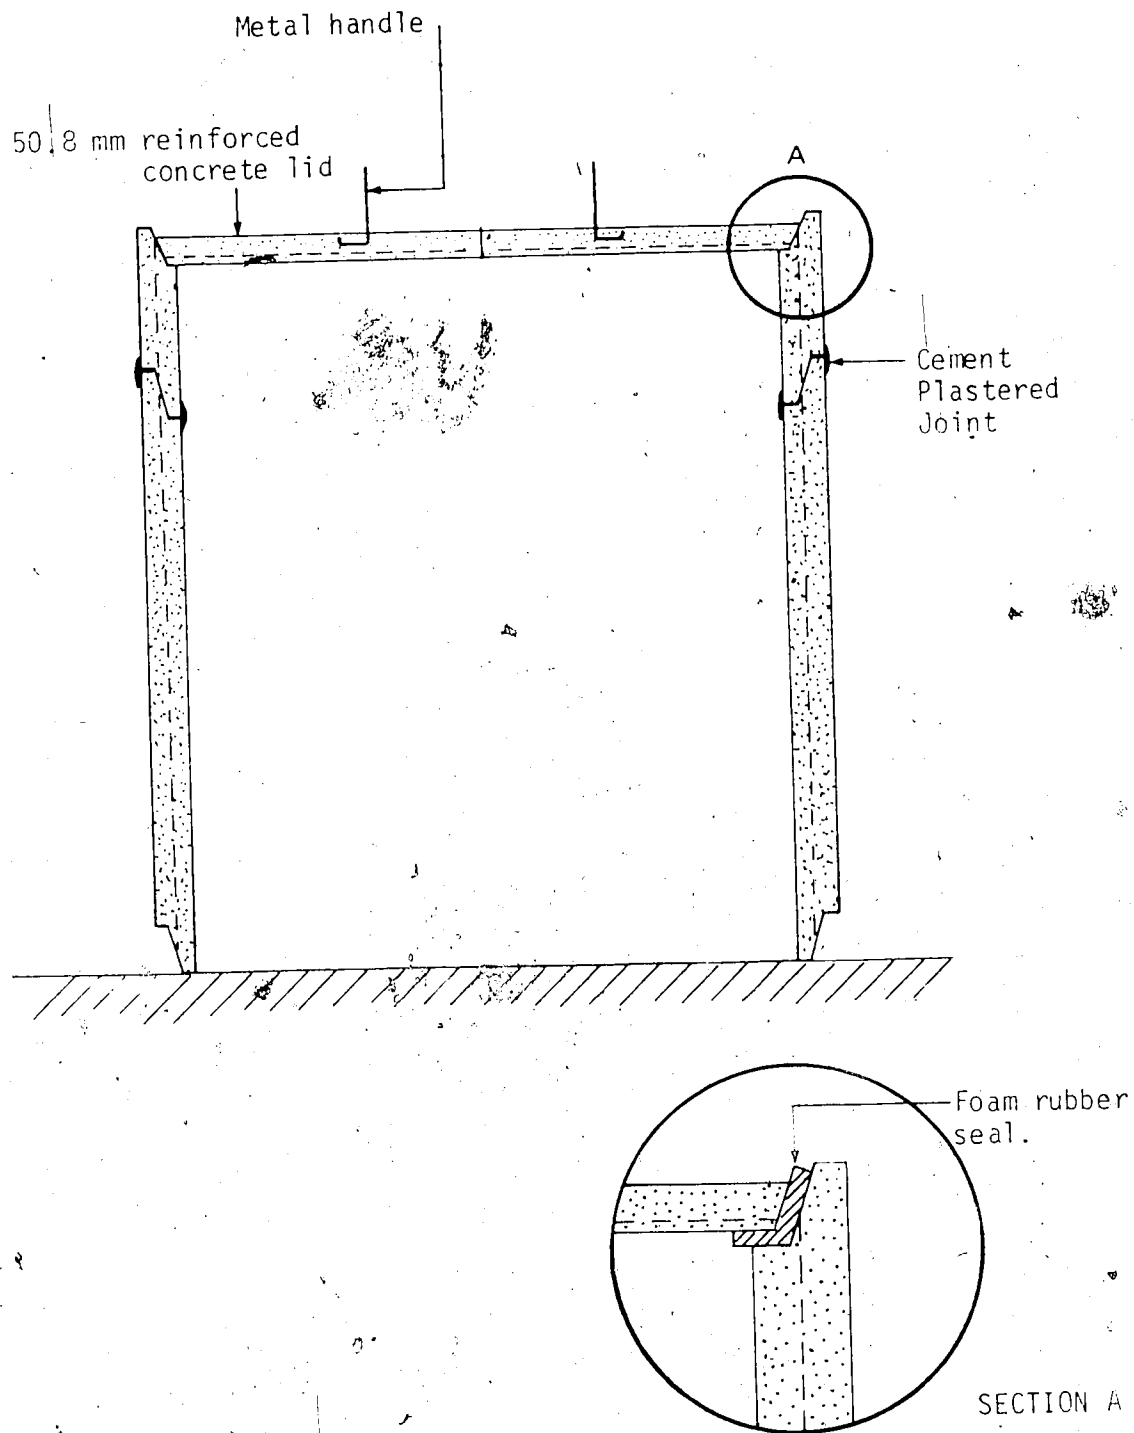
Vertical section of a concrete bin with section A showing the detail of the joint between the wall and the lid.
